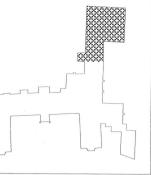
Ground Floor Plan - East (South Range and Blore Wing)
